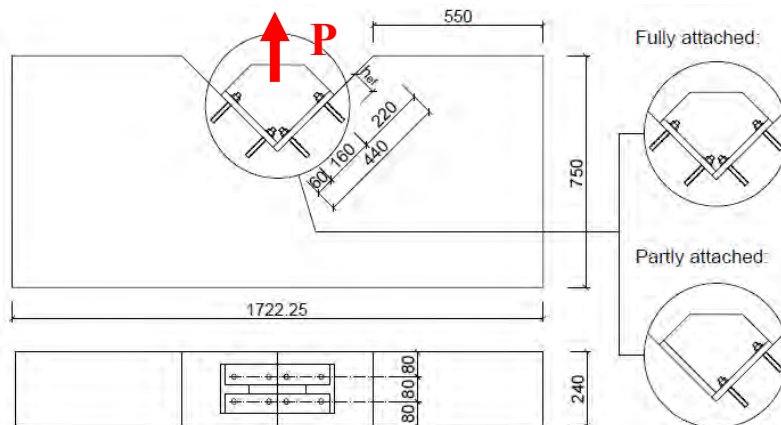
Dimensions of the concrete specimen. (Note: All dimensions are in mm).
